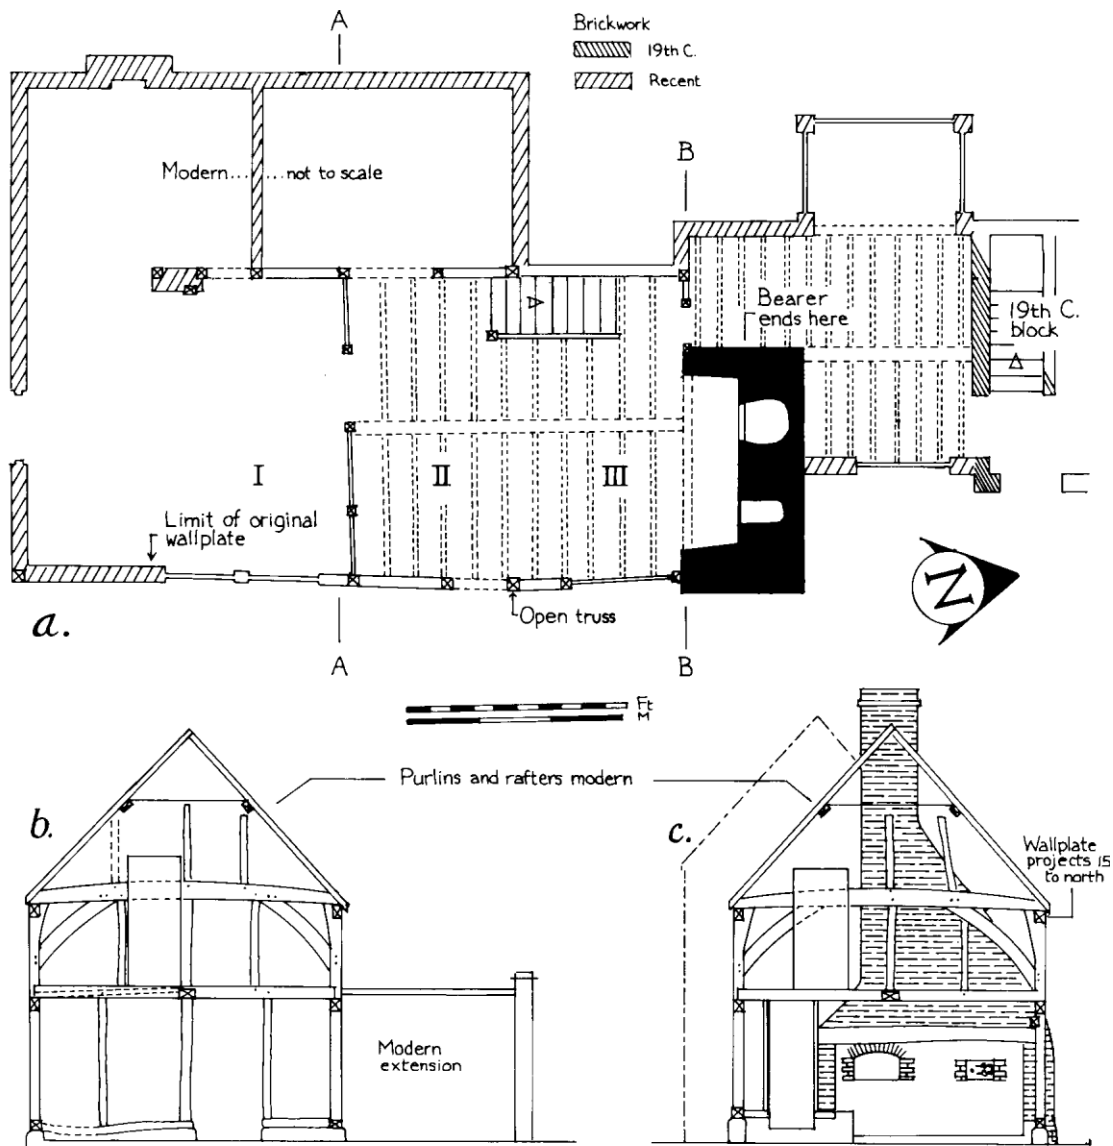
Larkins Green, (a) Ground plan: the original house occupied Bays I, II and III, its southern end being indicated by a broken line, (b) Section at A-A, looking south, (c) Section at B-B, looking north.
